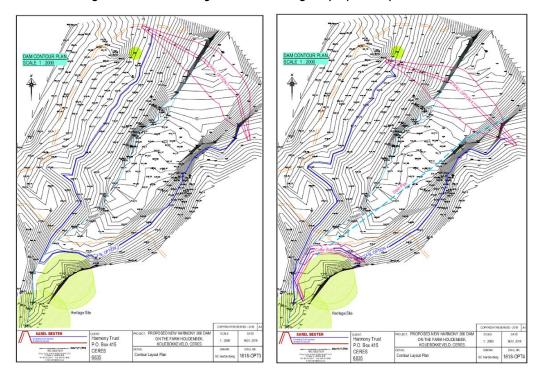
and d: Site Layout Plan indicating the proposed Options 3 (preferred) and 4
